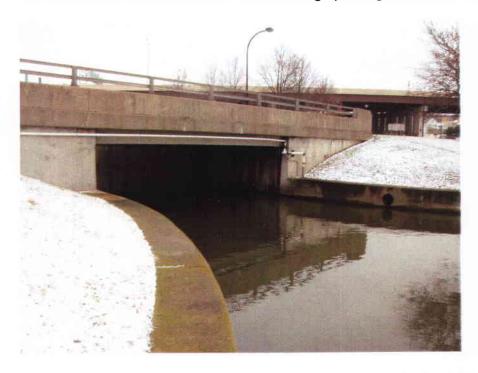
Downstream Side of Kelly Avenue Bridge (looking southeast)
